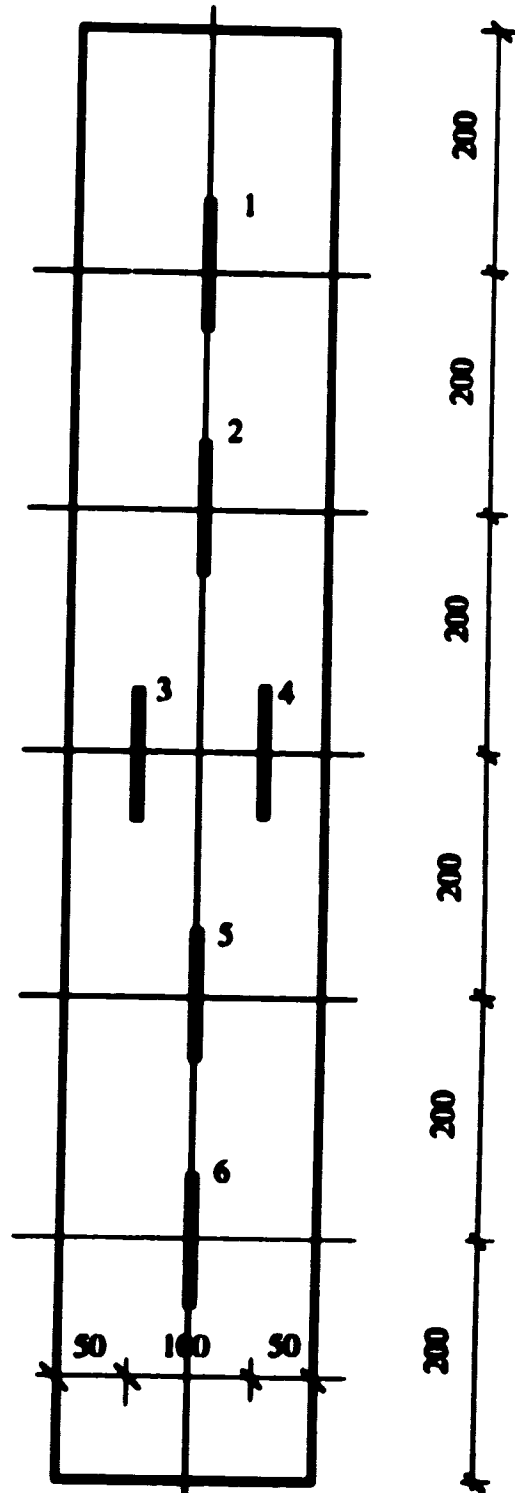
Strain Gauge Configuration on the Back Face of the Specimens
